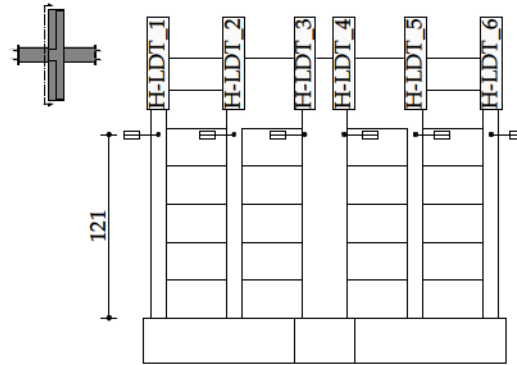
Arrangement of the joists and beam LDTs equipping specimens with the floor deck.
